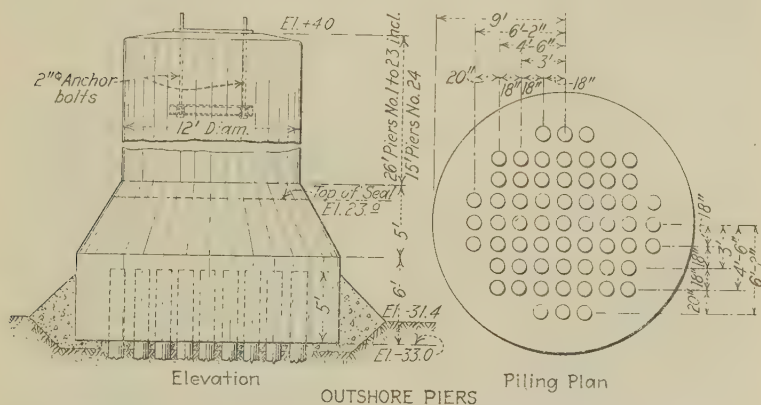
PLACEMENT OF CAISSON OVER FOUNDATION PILES.
